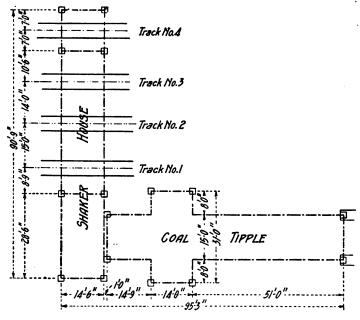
FOUNDATION PLAN, COAL TIPPLE FOR FRANKLIN COUNTY CONSTRUCTION COMPANY.
